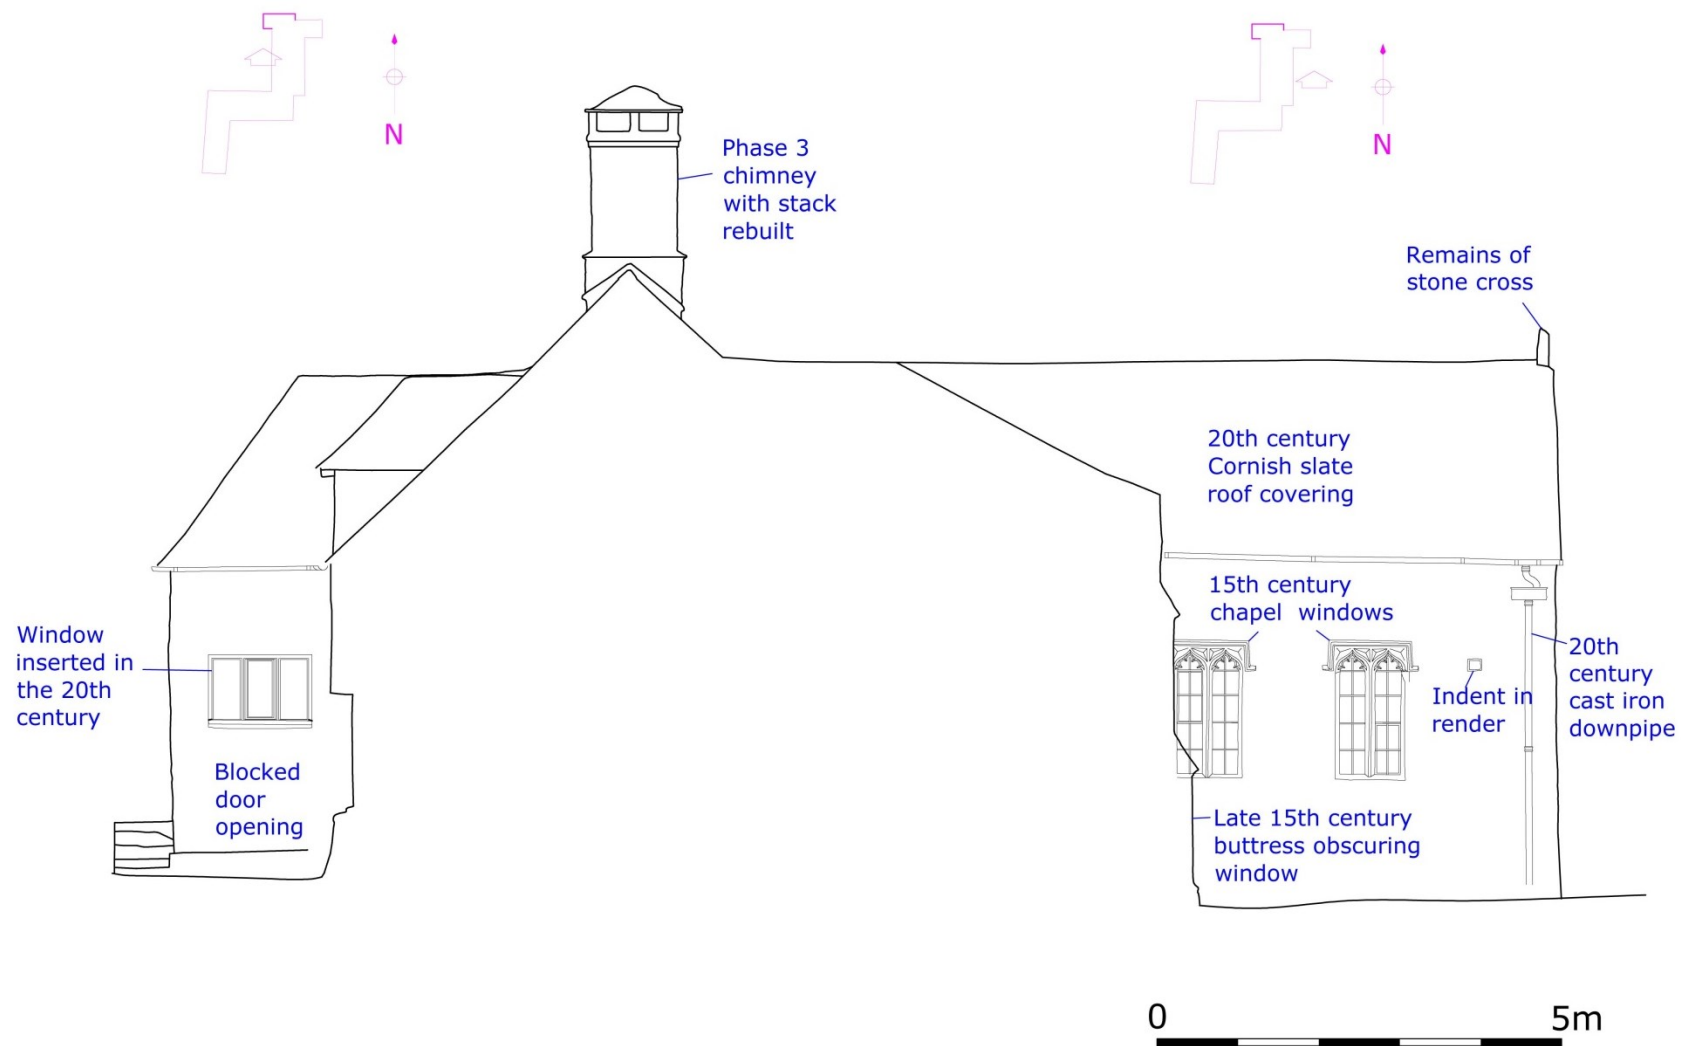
Manor House: South elevation of Stair Projection and Chapel Wing
